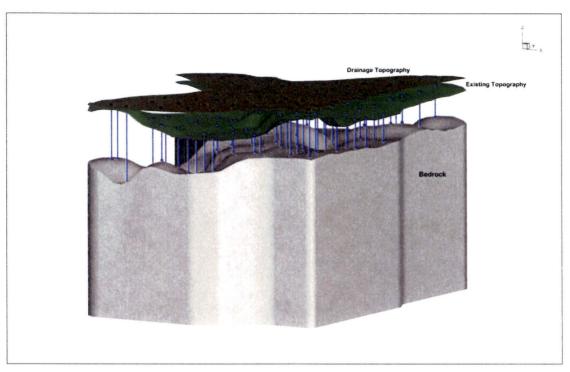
Surveyed Corehole Locations and Elevations, Shown with Drainage Plan and Bedrock Surfaces, Survey Unit 6
